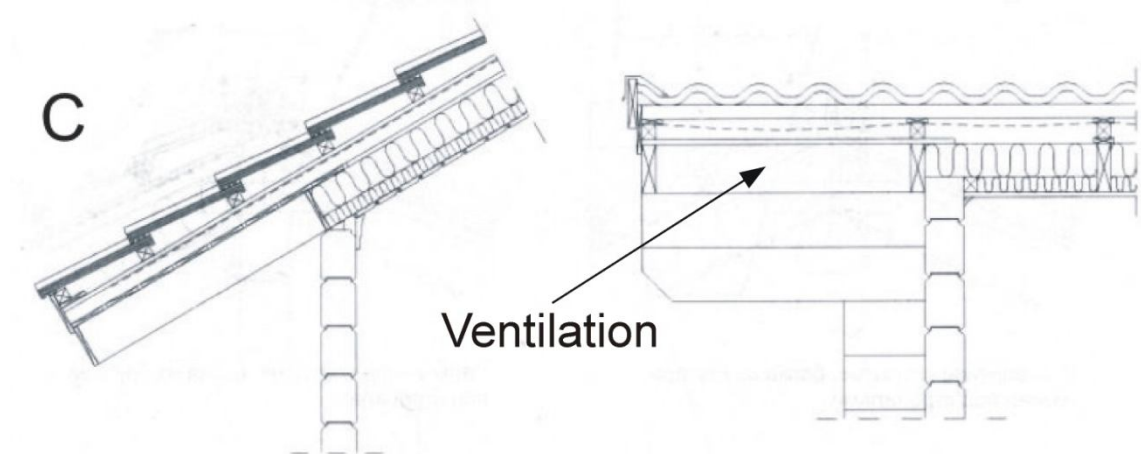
Different kinds of roofs and eaves, C – Tiled roofing
